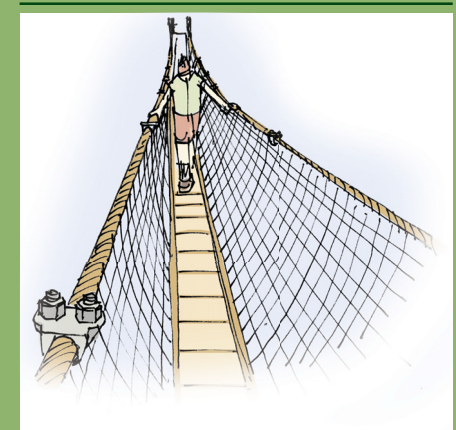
Cable Bridge Crossing on an Adventure Trail
